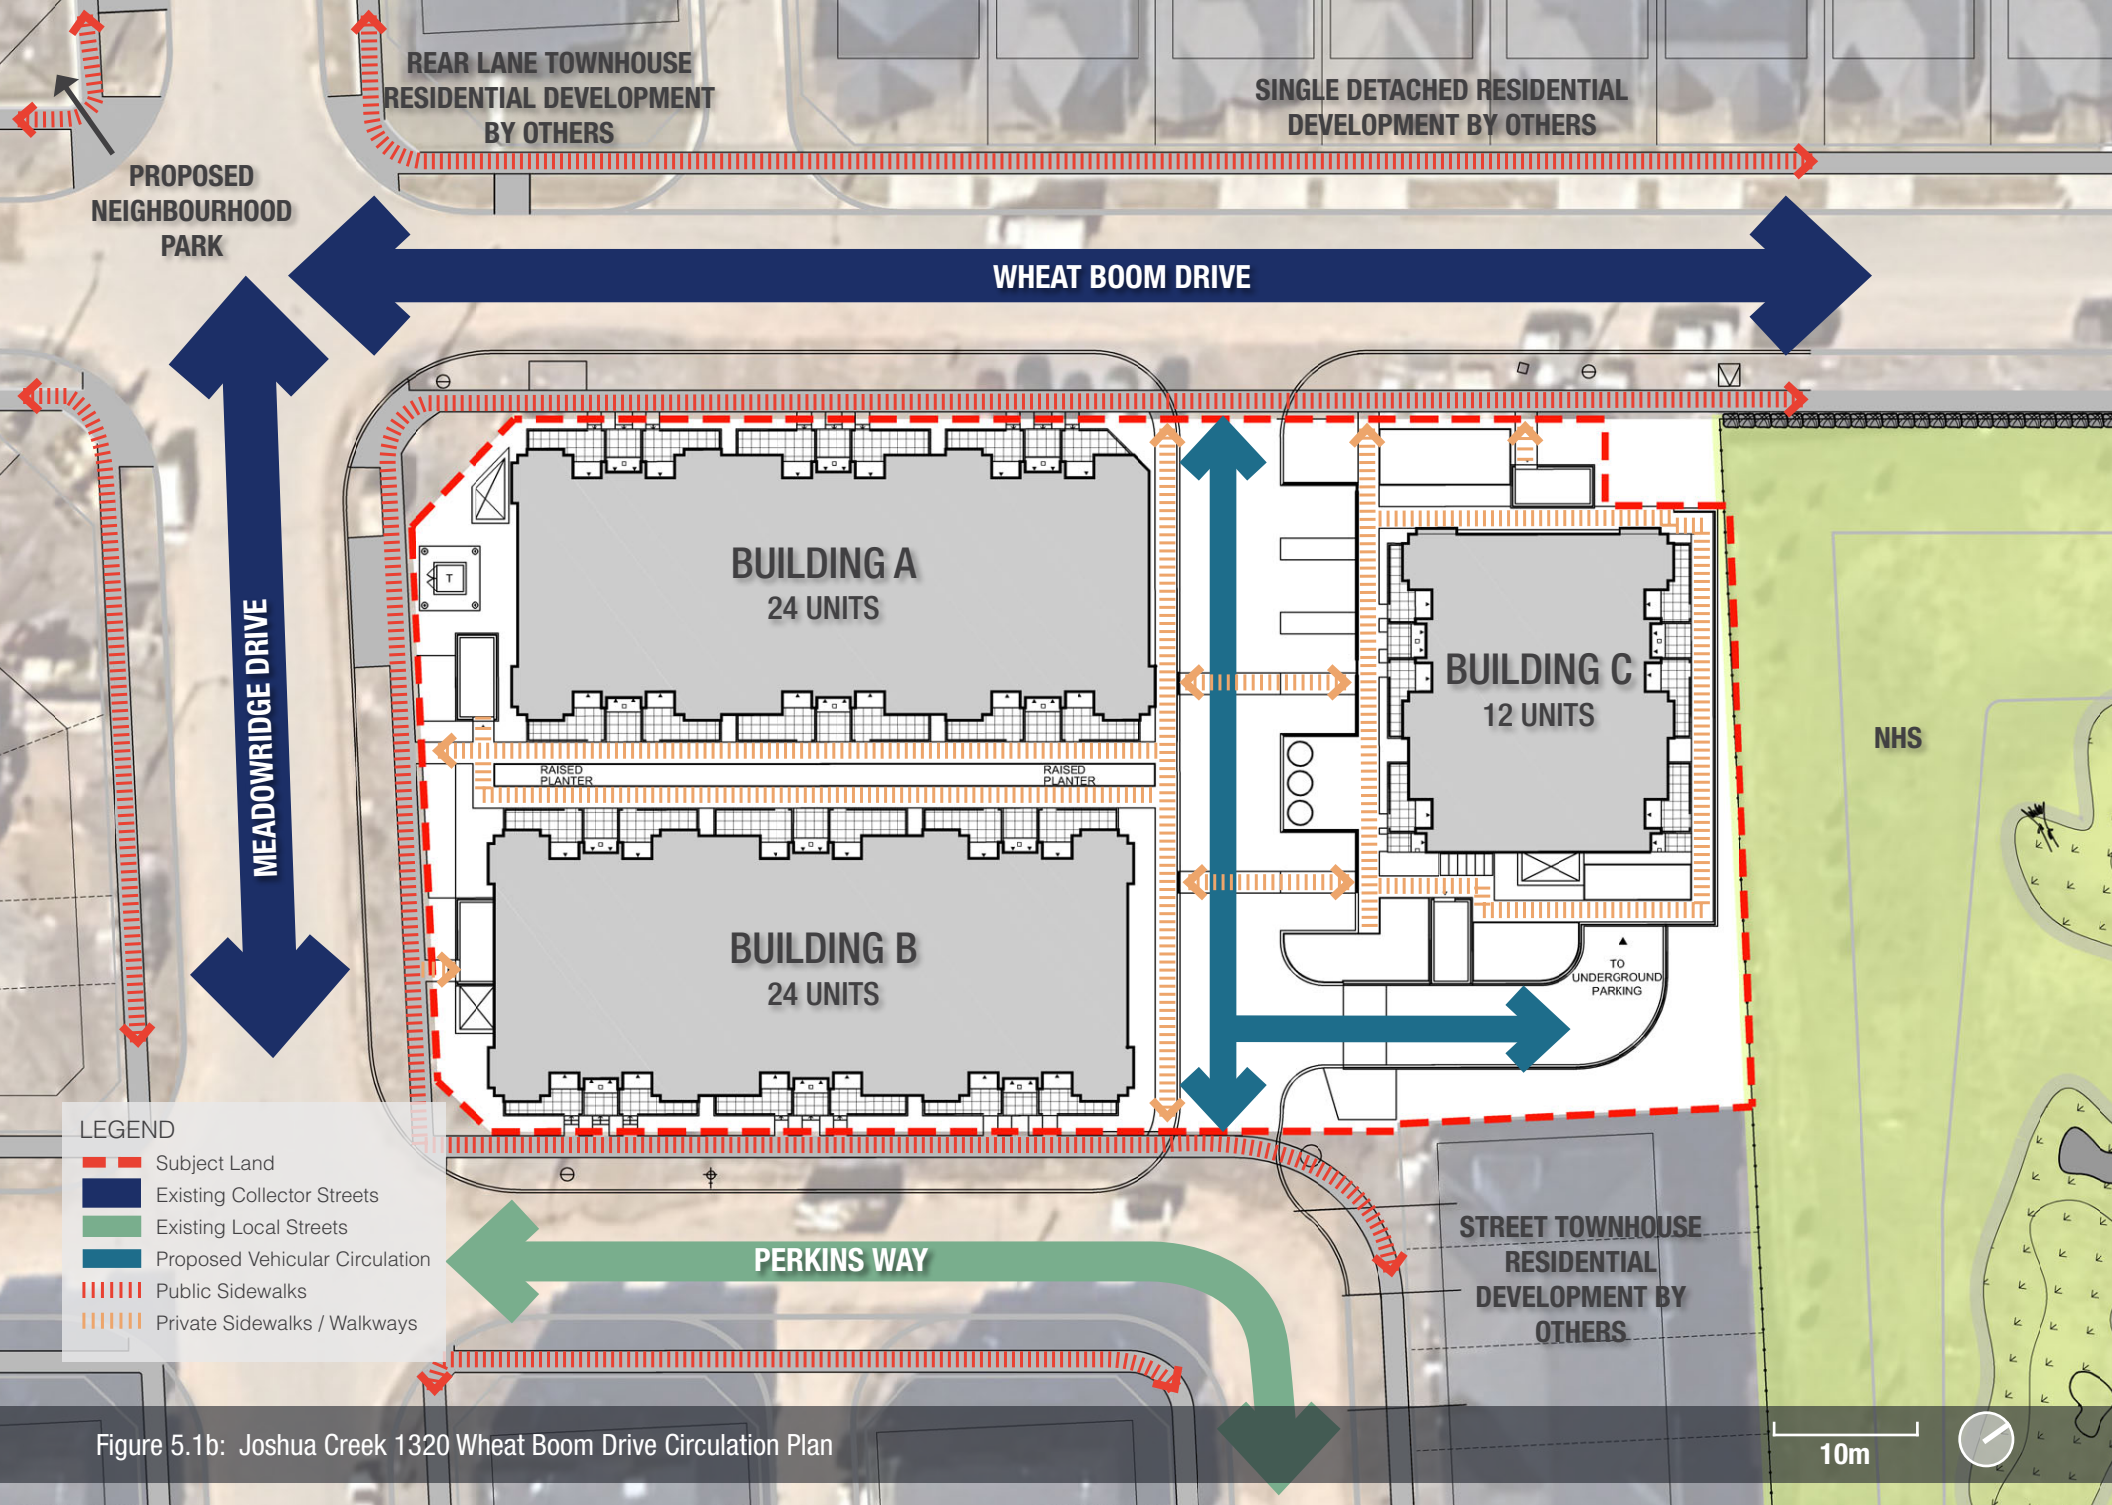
Joshua Creek 1320 Wheat Boom Drive Circulation Plan
